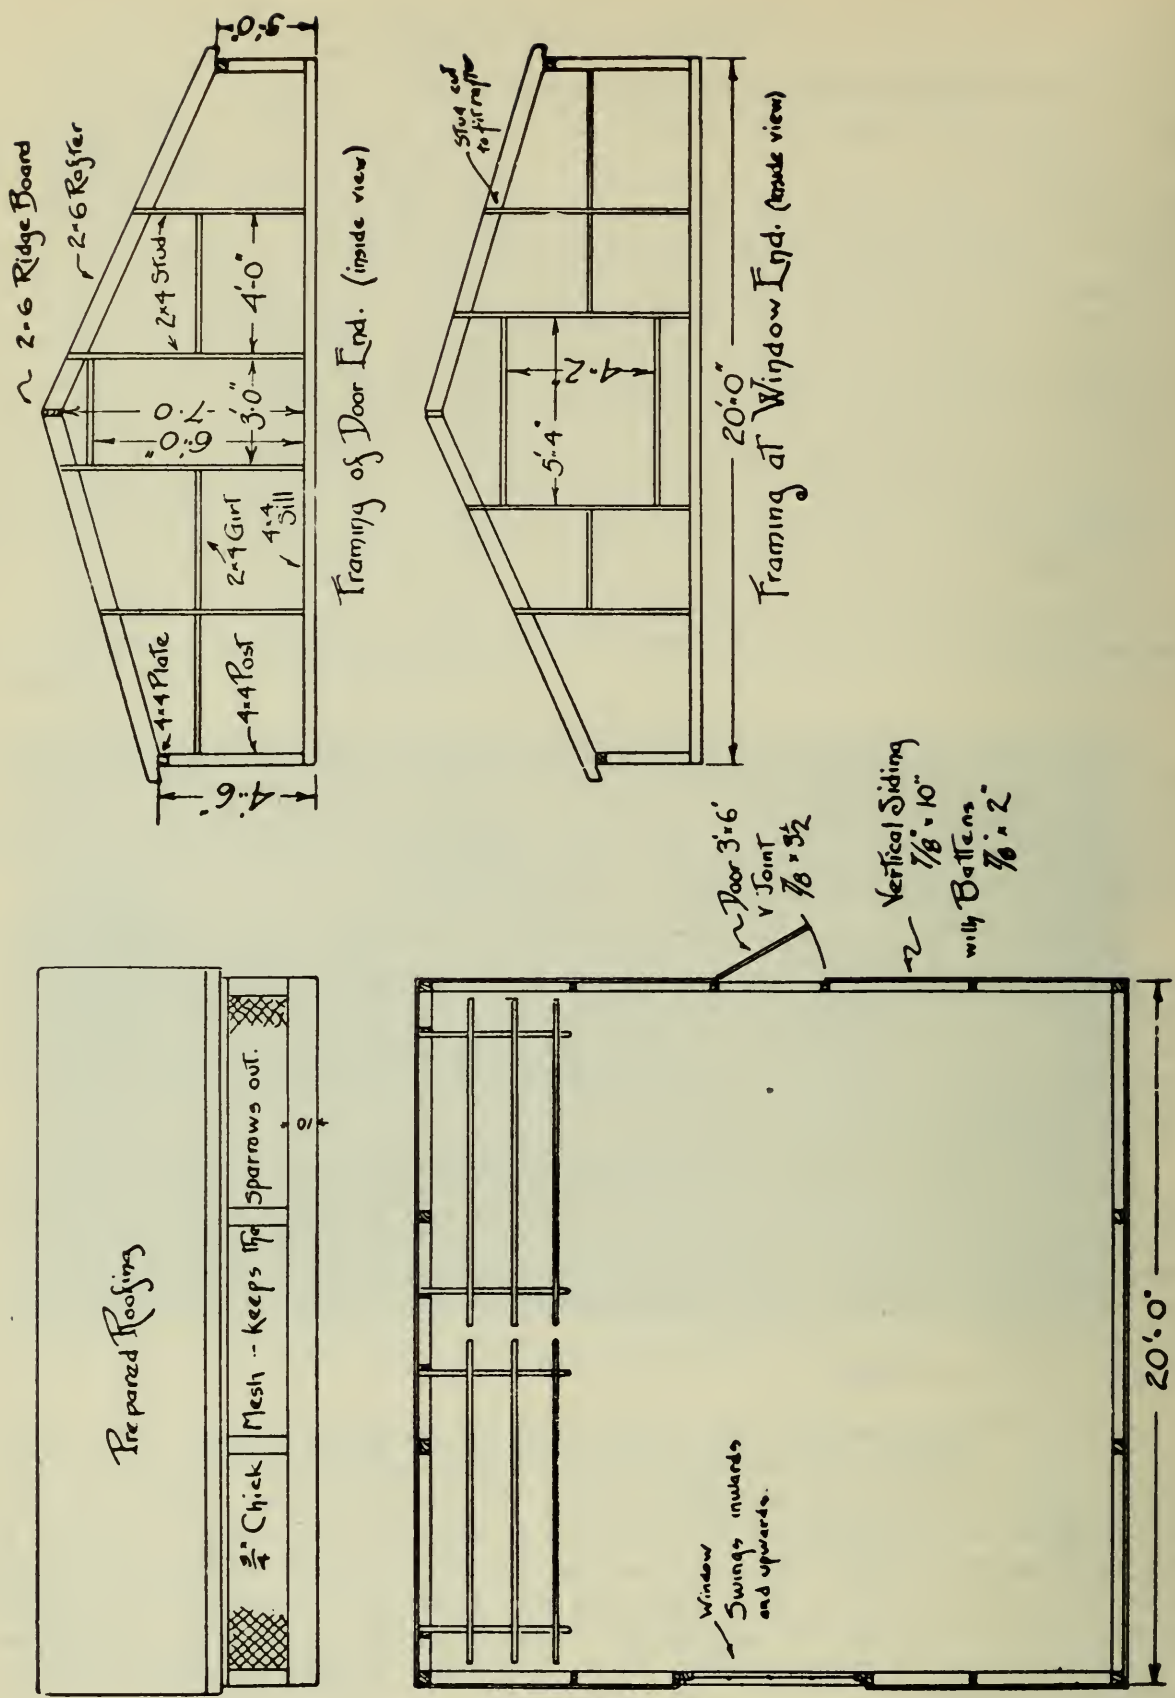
Plan, elevation and framing sections of a twenty-foot square Open Front House, suitable for the accommodation of one hundred hens.
